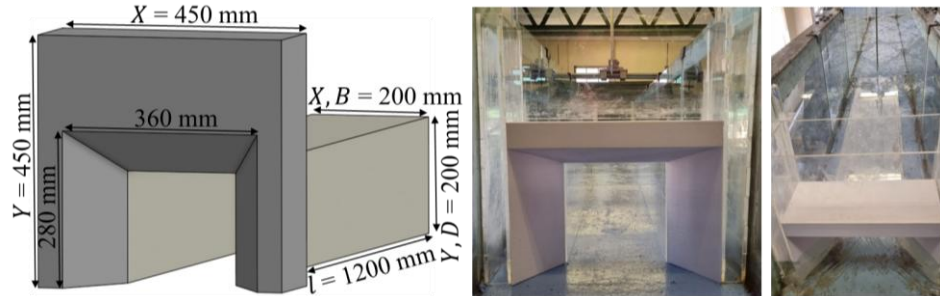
Model culvert dimensions and model culvert installed in the hydraulic flume
